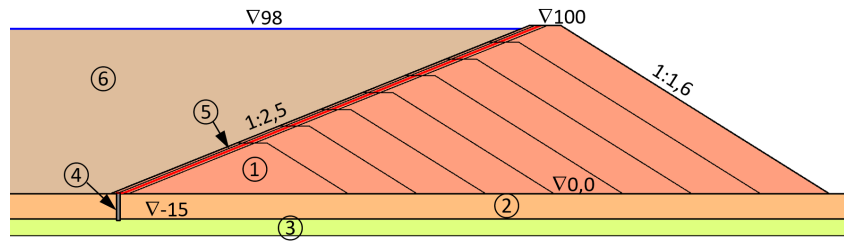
Diagram of the tailing dam structural design: 1 – rockfill; 2 – foundation alluvial layer; 3 – rock foundation; 4 – cut-off wall made of clay-cement concrete; 5 – face made of polymer geomembrane; 6 – slimes.
